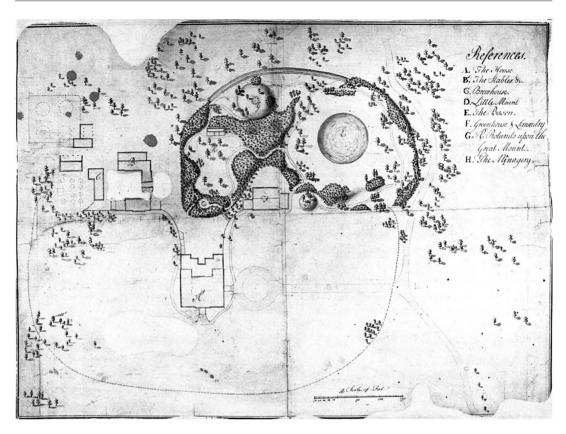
Plan of the buildings and proposed walled garden, probably made in the 1750s.
